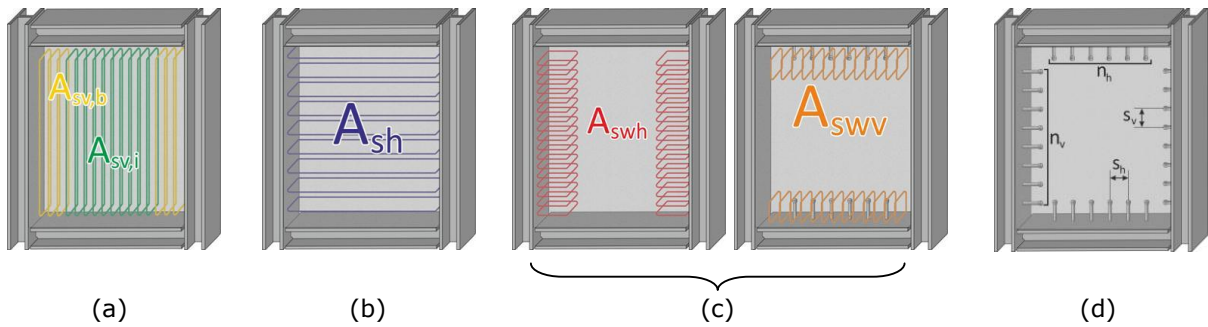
Wall reinforcements: (a) vertical reinforcements; (b) horizontal reinforcements; (c) confining hoops; (d) stud connectors.
